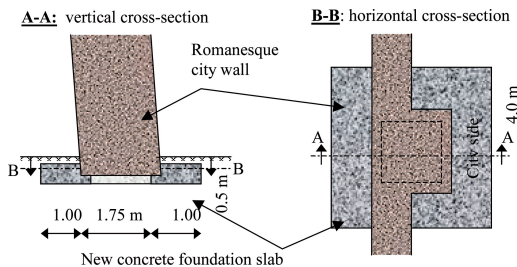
Foundation strengthening – new reinforced concrete foundation slab.
